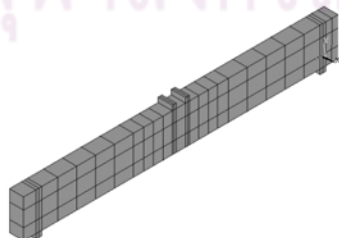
Notched reinforced concrete beam by Sumarac (2003)
